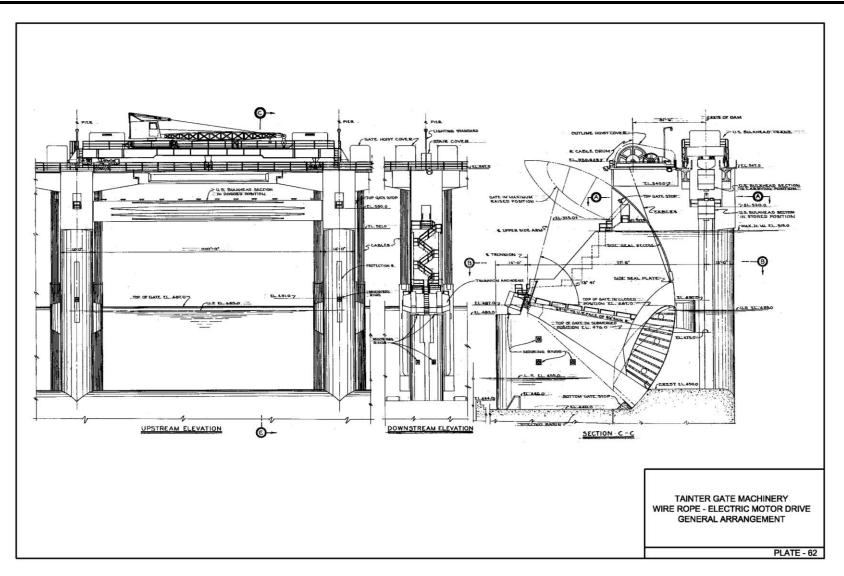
Plate 62: Tainter gate machinery, wire rope-electric motor drive, general arrangement
